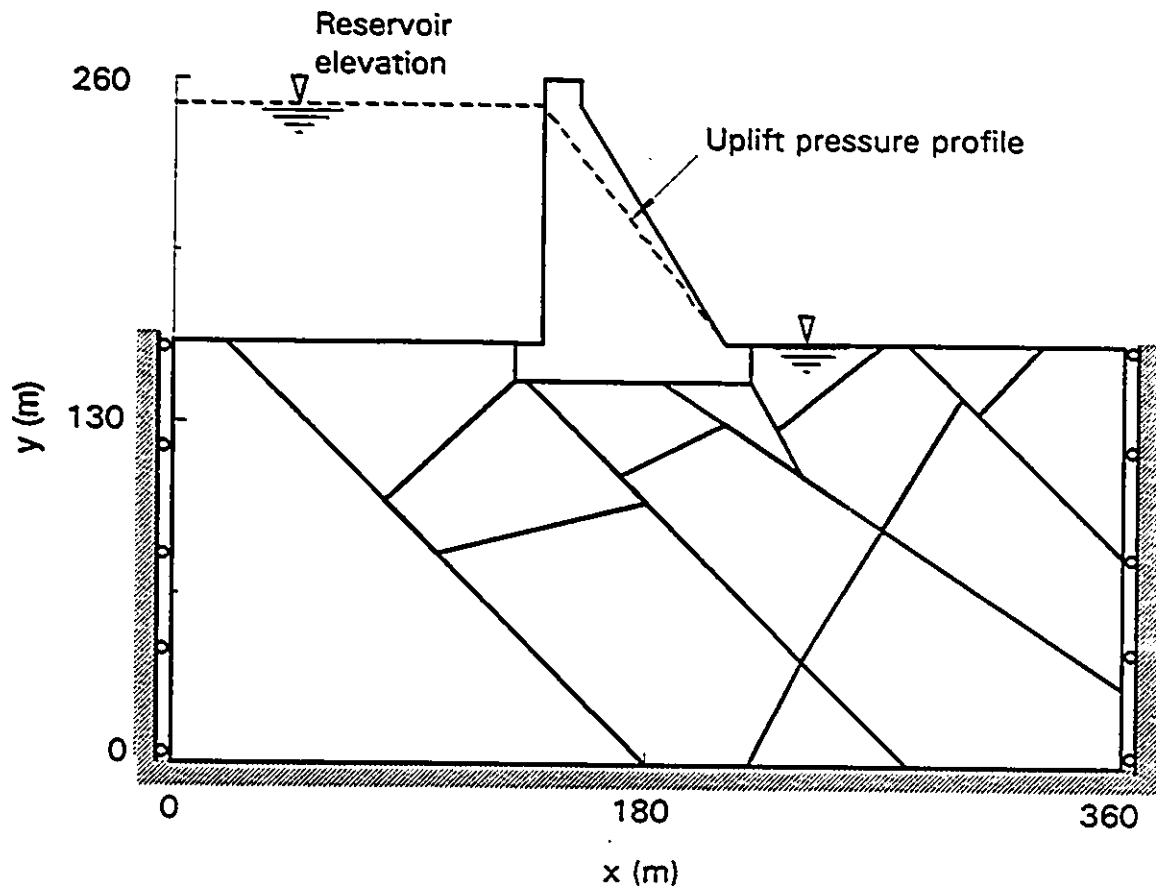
Example 5: A hypothetical rock foundation of a concrete dam
